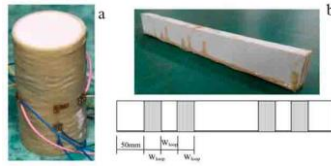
Applications of GFRP (Glass Fiber Reinforced Polymer) sheet reinforcement in precast concrete members include: (a) a precast concrete column wrapped with GFRP sheets, and (b) a precast concrete beam wrapped with GFRP sheets (Feng et al., 2015)
